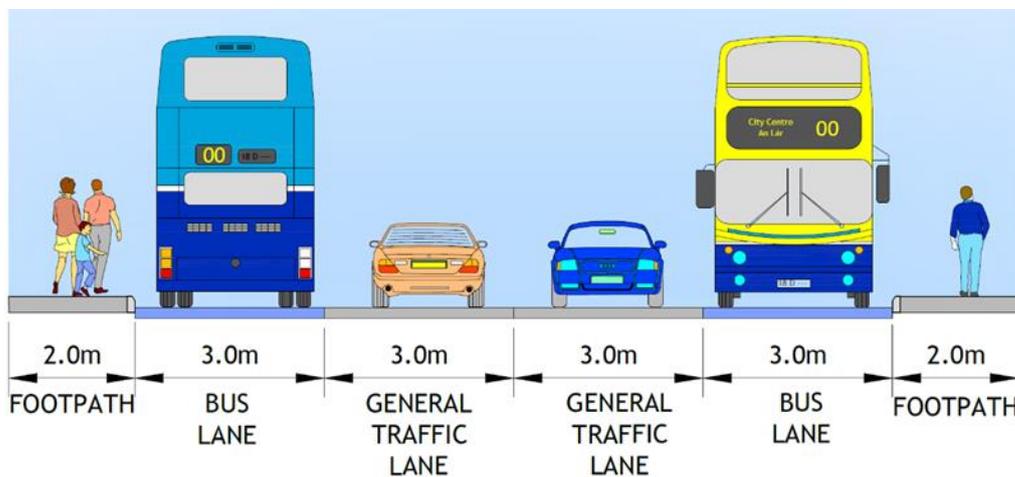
Cross-Section A-A (Relevant to TG2 and TG3)
